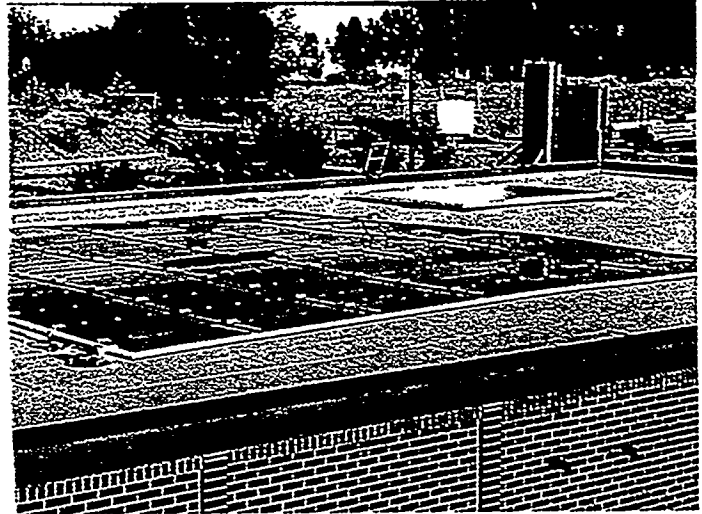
SMUD/WAPA Building Integrated 3 kW PV Roofing System
